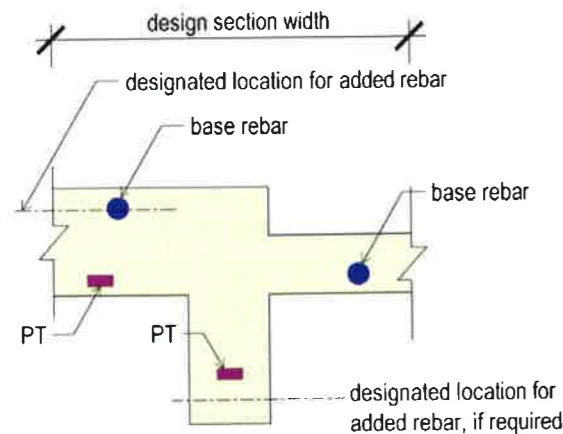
A-1 Cross-Sectional Geometry of a Design Section Showing the Base Reinforcement, and Location of Added Rebar
